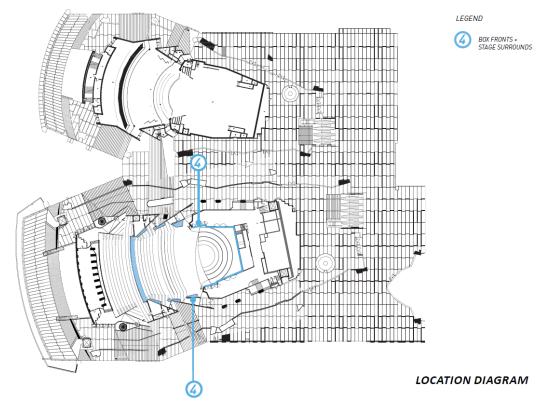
Concert Hall Schematic Design – Plan showing Diffusive Surface Treatments
